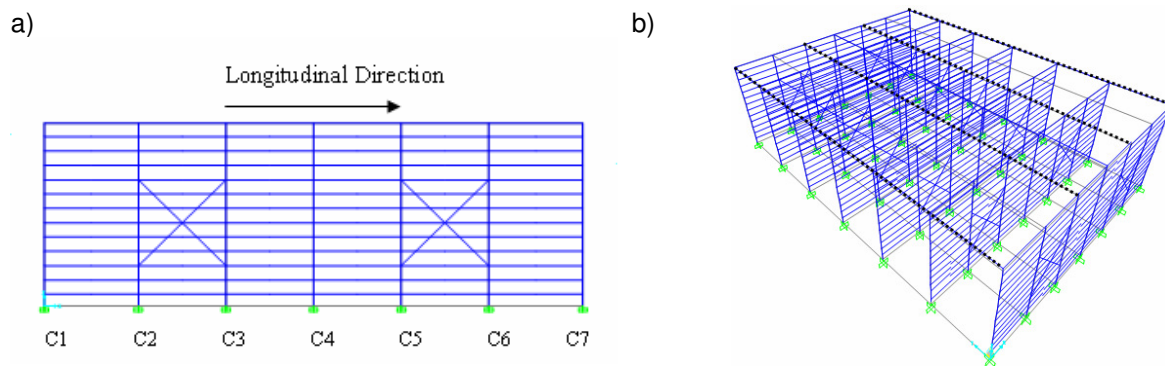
a) 2D elevation and b) 3D view of the shelving system model
